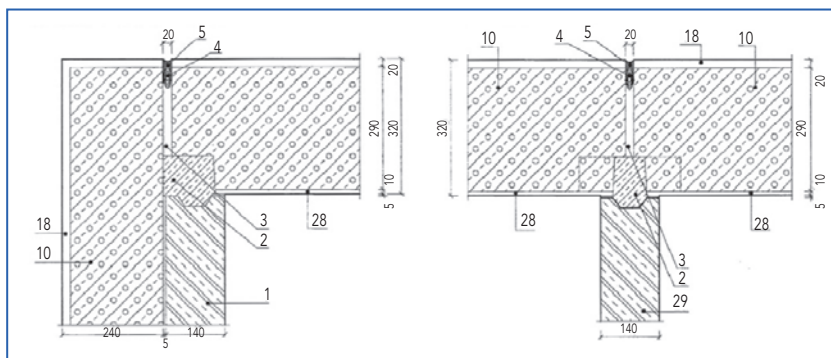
Plan view of multi-family house wall type T06B-KE (left – corner, right - contact of peripheral panels), [9].
